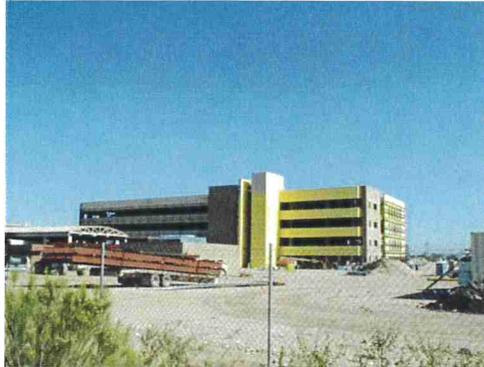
From South Country Club Road looking west onto the proposed site at the construction of the County Health Administration Building
